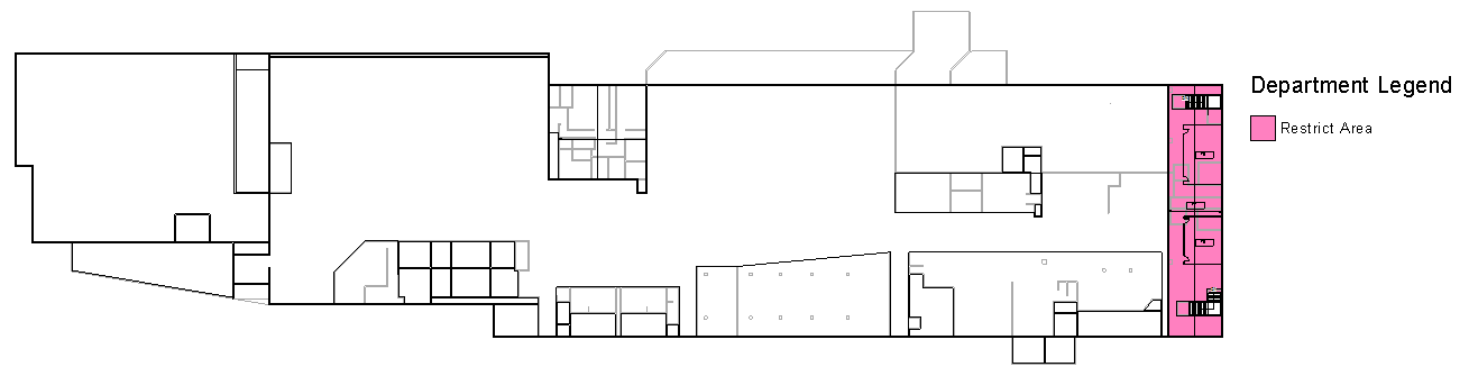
Terminal A First Floor Plan (Divided by Room Type)
